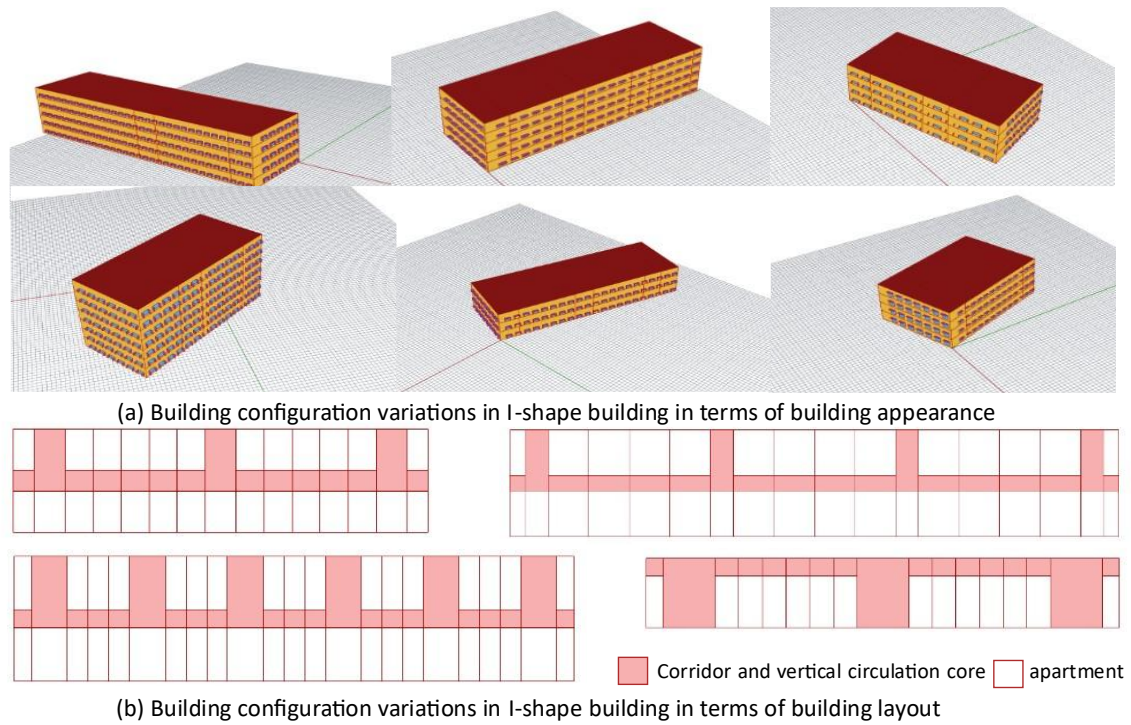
Building configuration variations in I-shape building, including building appearance and layout.
